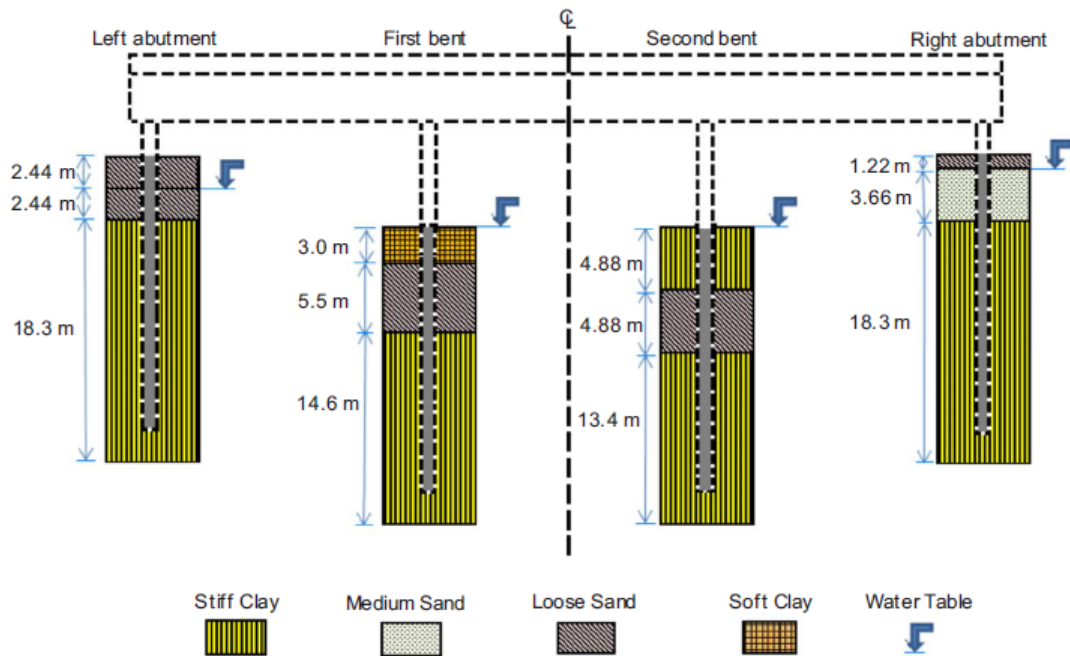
OpenSees finite element model of bridge-foundation-ground system (Zhang et al., 2008).
